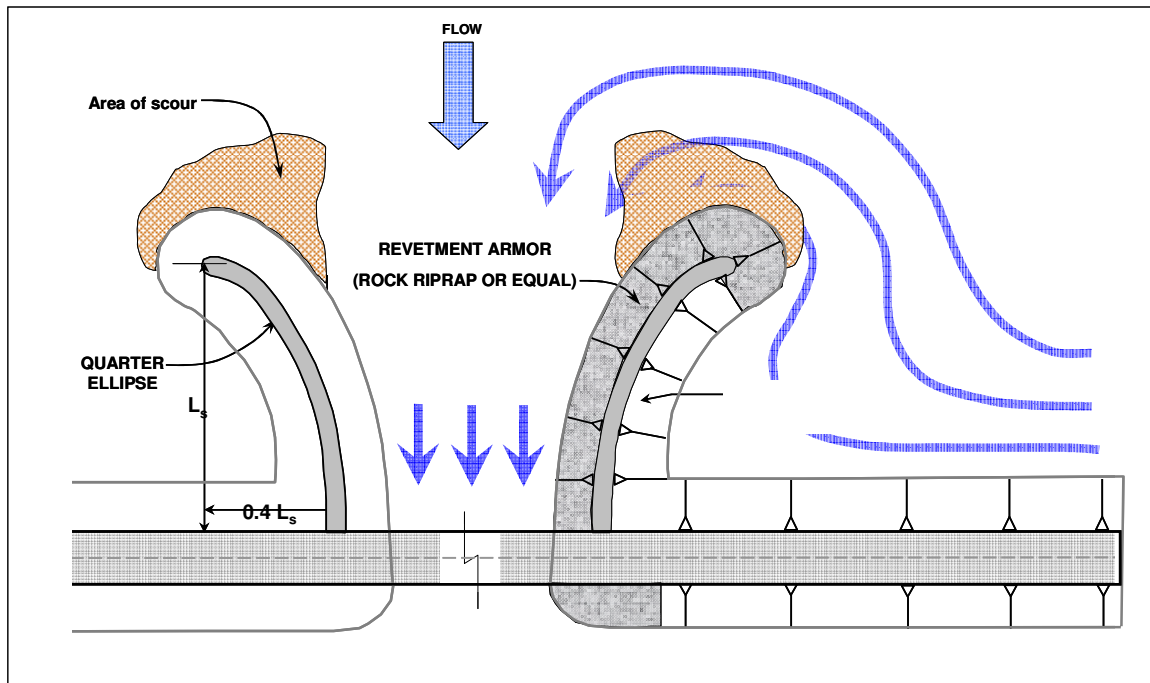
Typical guide bank layout (after Bradley 1978).
